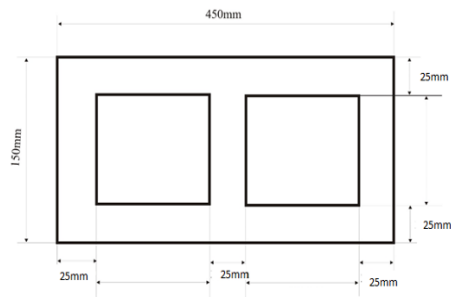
Laying Face of Hollow Non-Load Bearing Block
